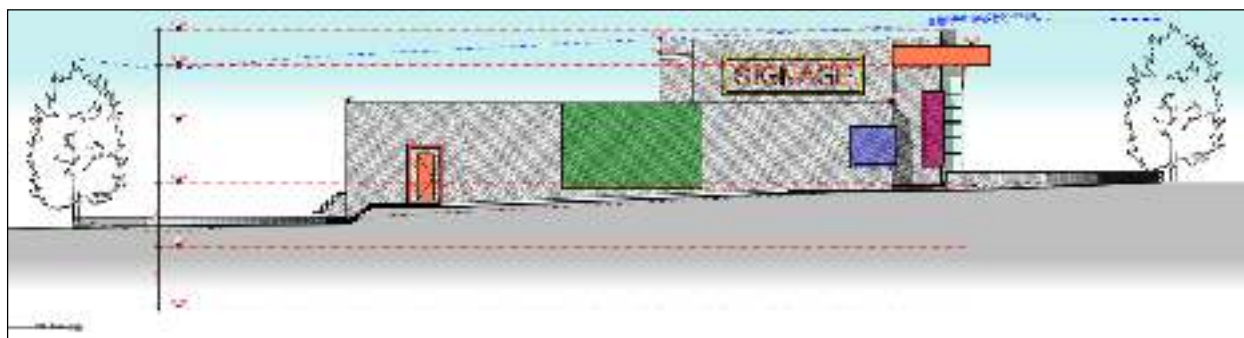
Elevation of proposed child care centre illustrate proposed location of signage.
